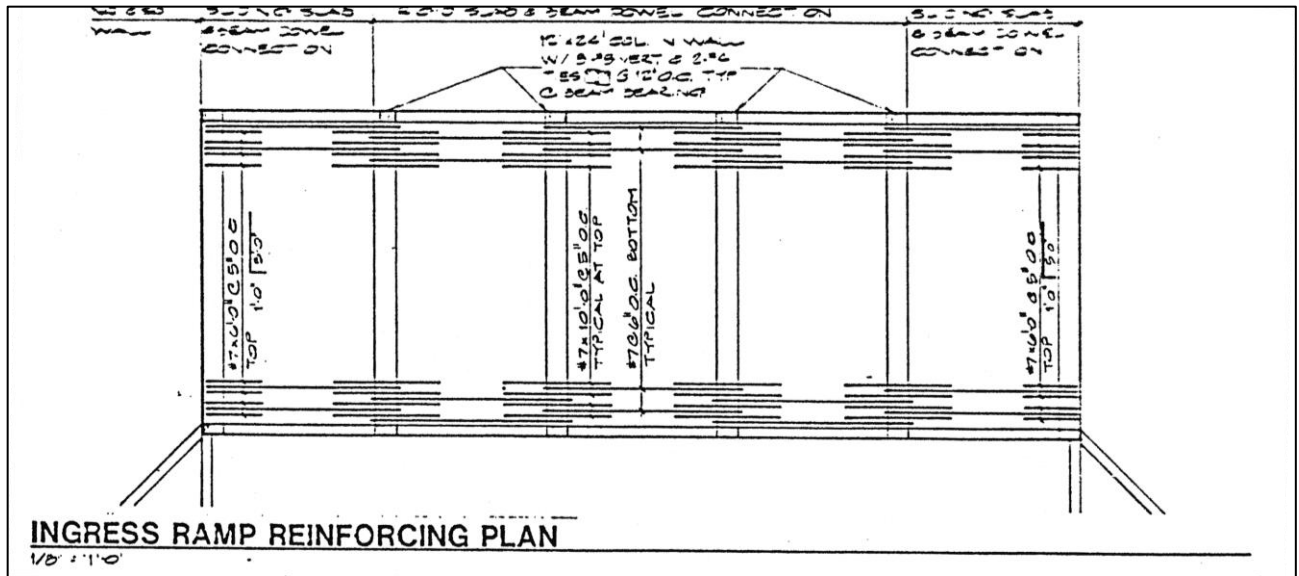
Example of the as-built 1988 structural drawings showing the epoxy reinforcement in the entrance (“ingress”) bridge from the ingress ramp to the first floor of the garage.
